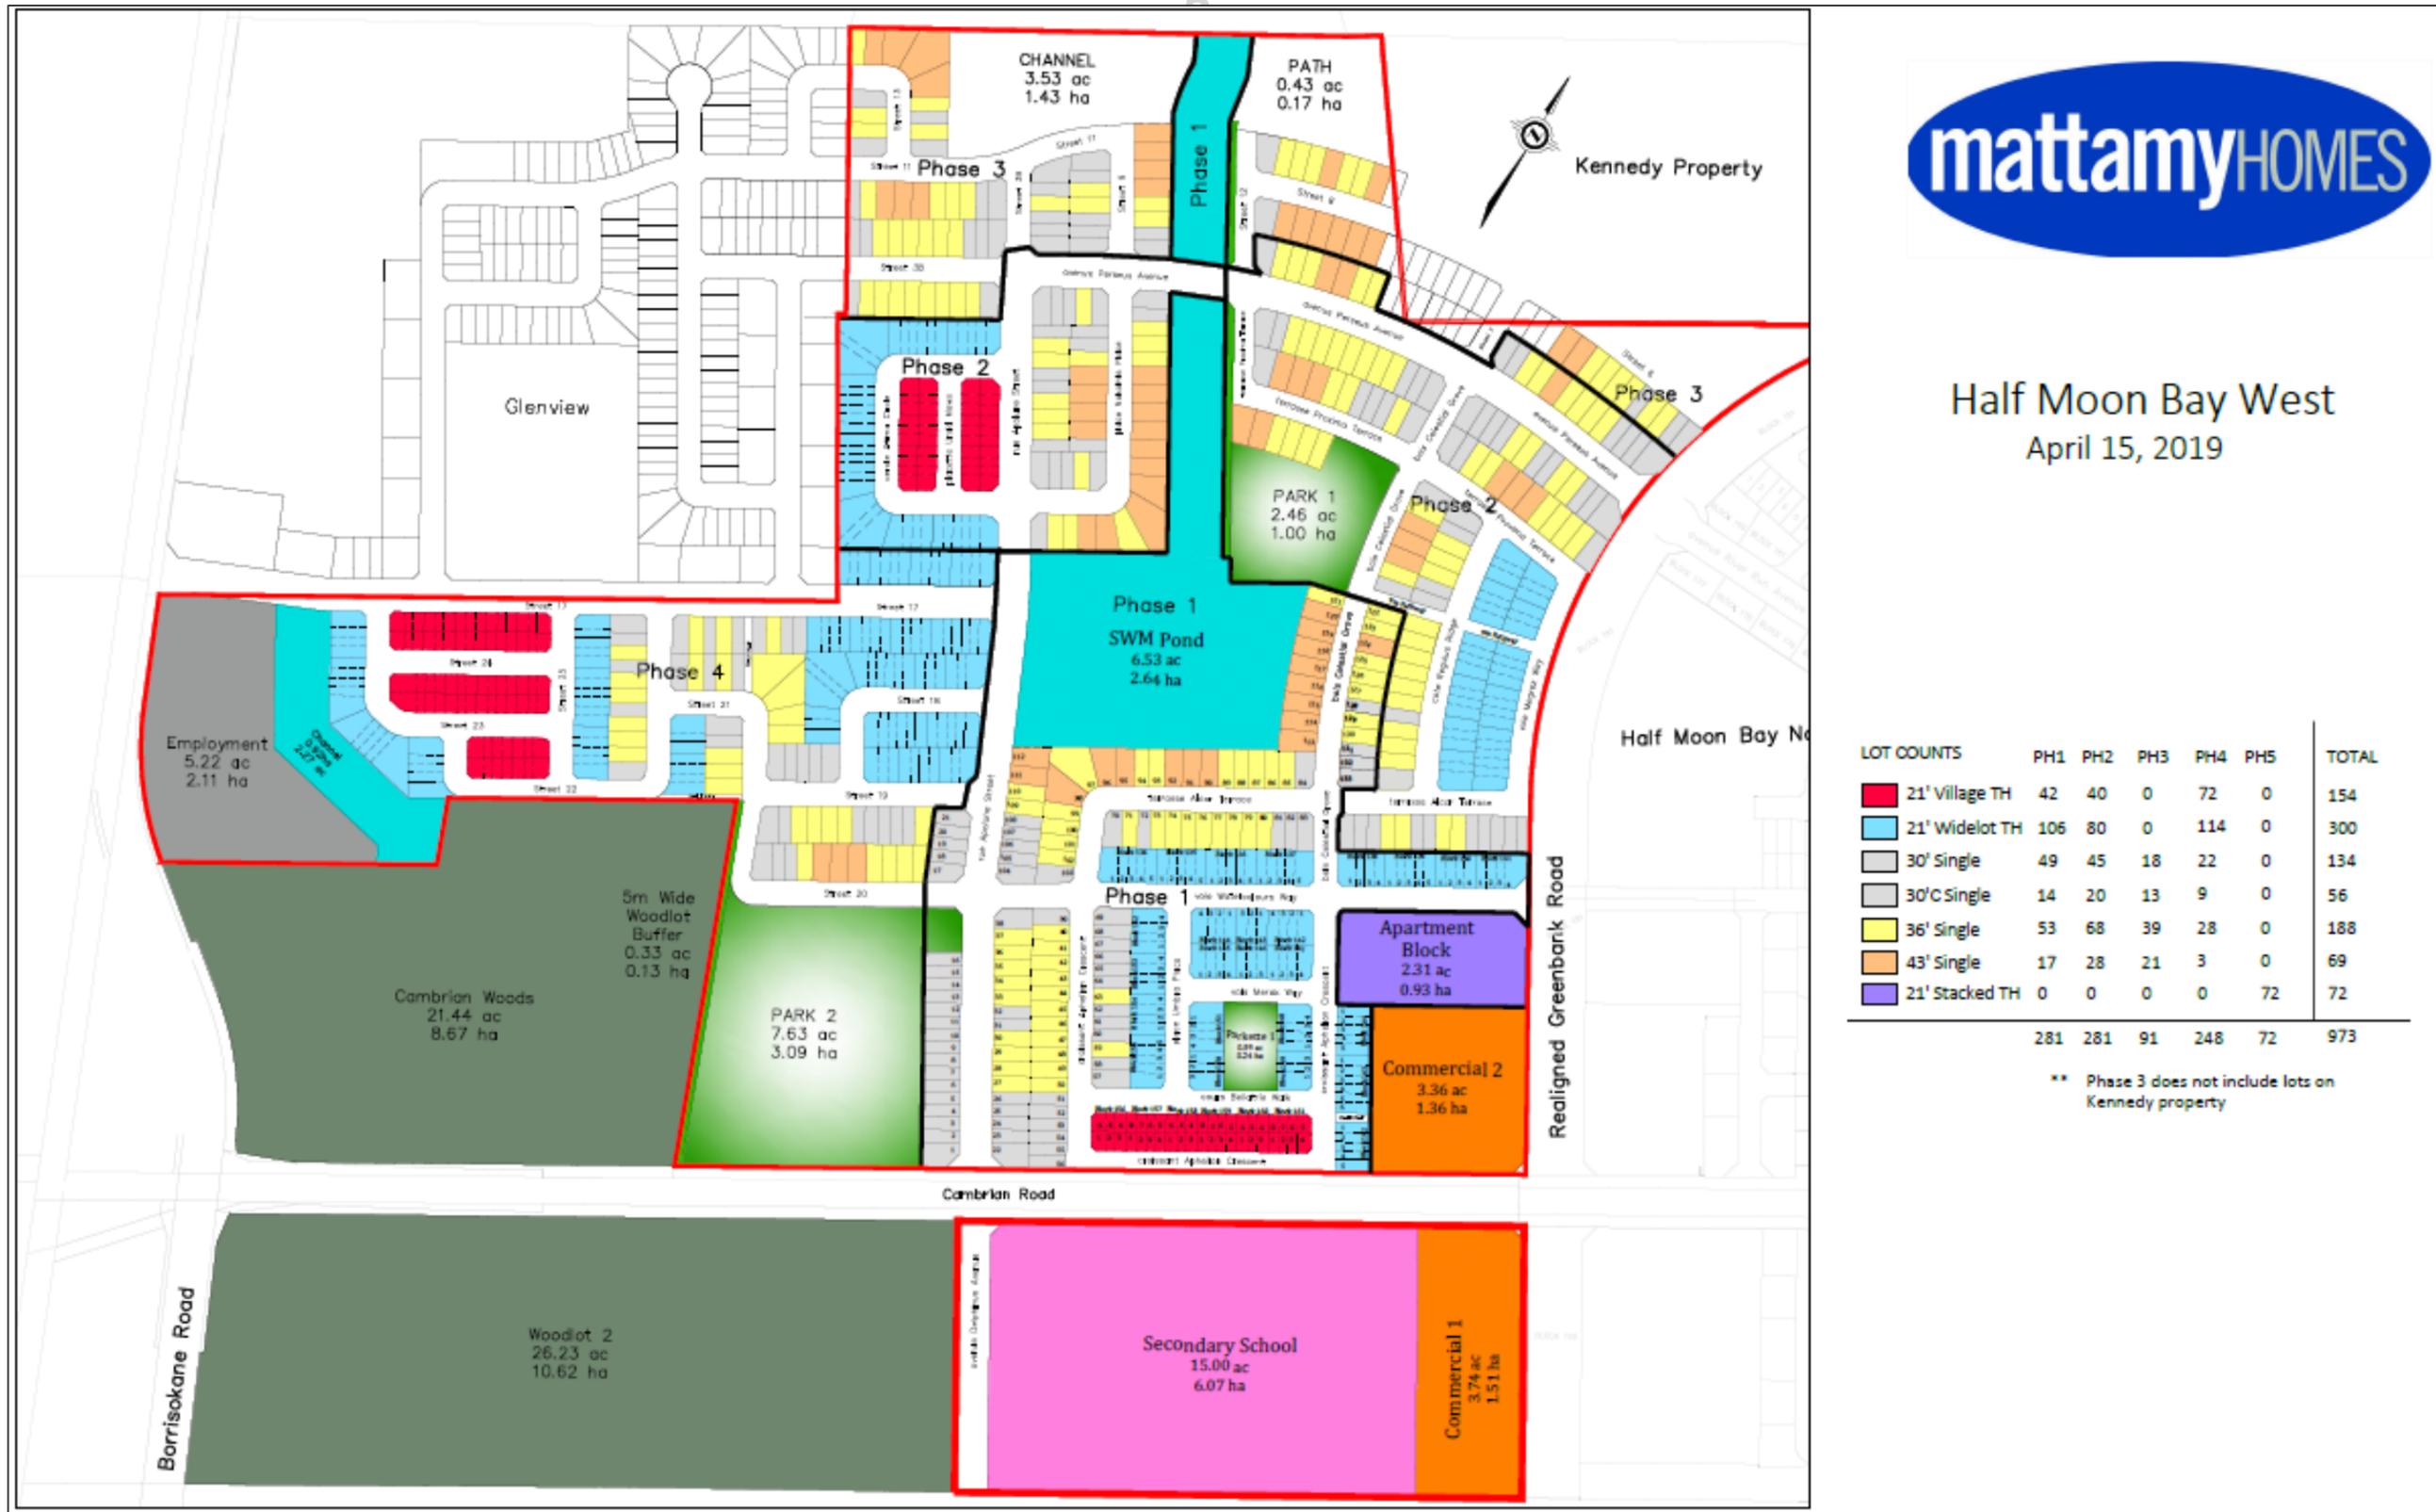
Revised Concept Plan for Mattamy's Half Moon Bay West subdivision
